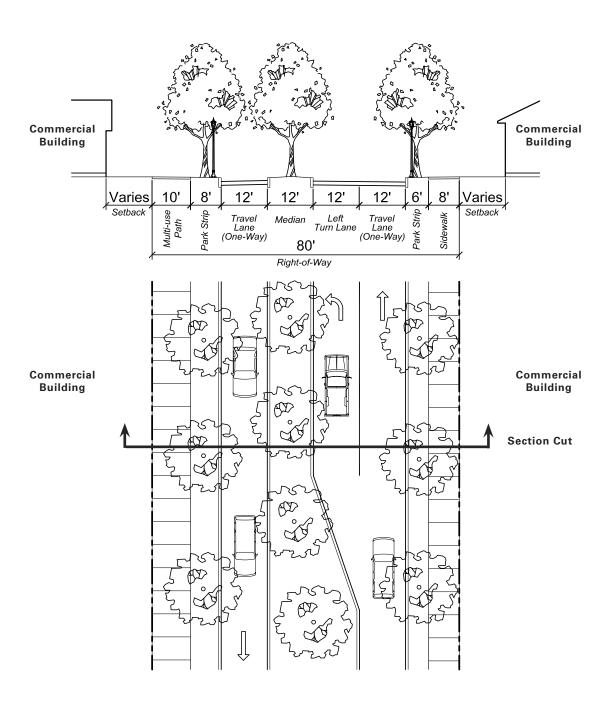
Proposed Section and Plan: Village Center Street B
